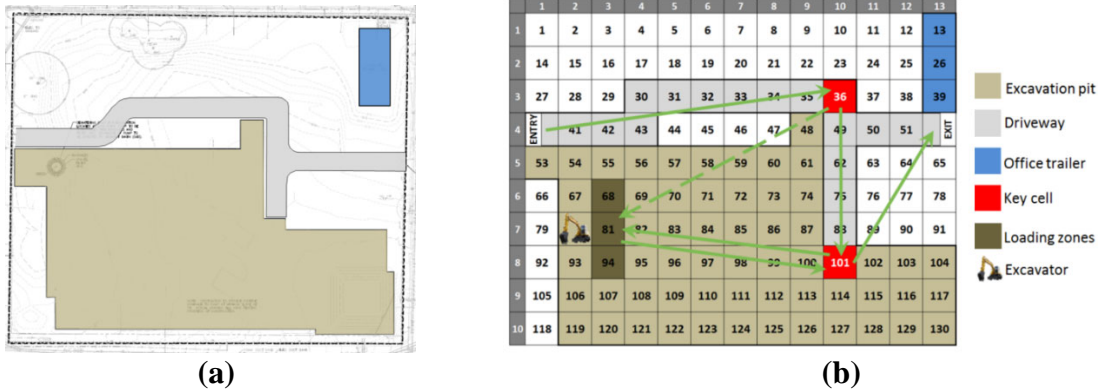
(a) Site layout map for excavation site, (b) Excavation site divided into grids
